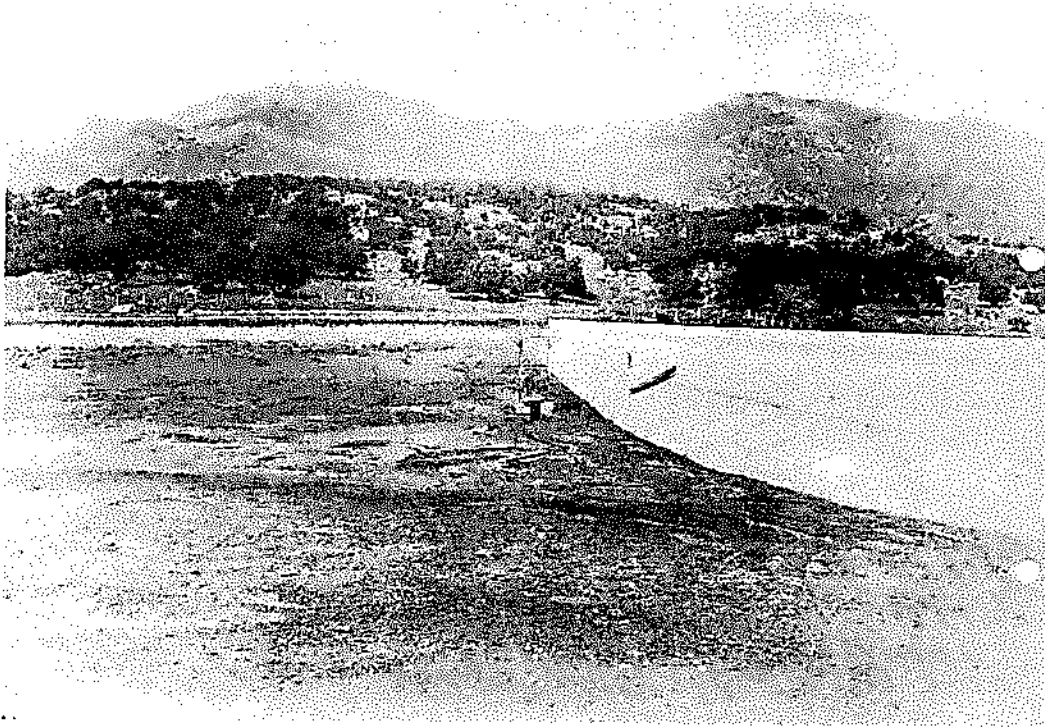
SHEFFIELD DAM BEFORE FAILURE
